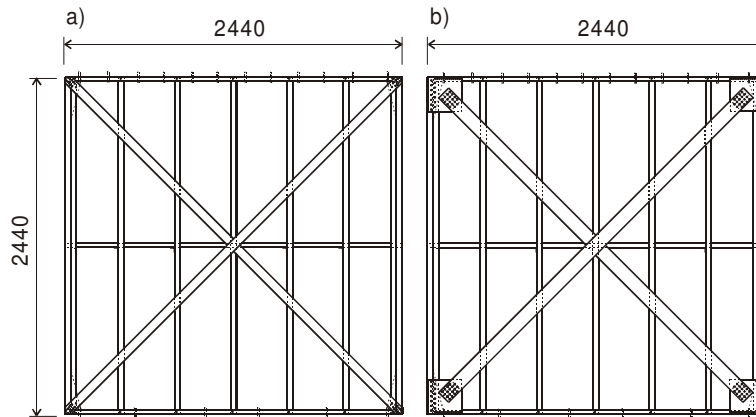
Schematic drawing of strap braced test walls: a) light, b) medium (mm).
